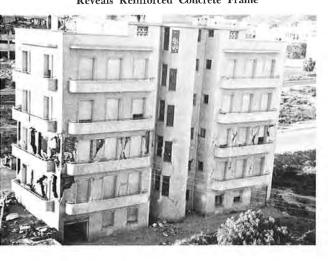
Reinforced Concrete Frame Carries Load in Spite of Damage to Masonry
